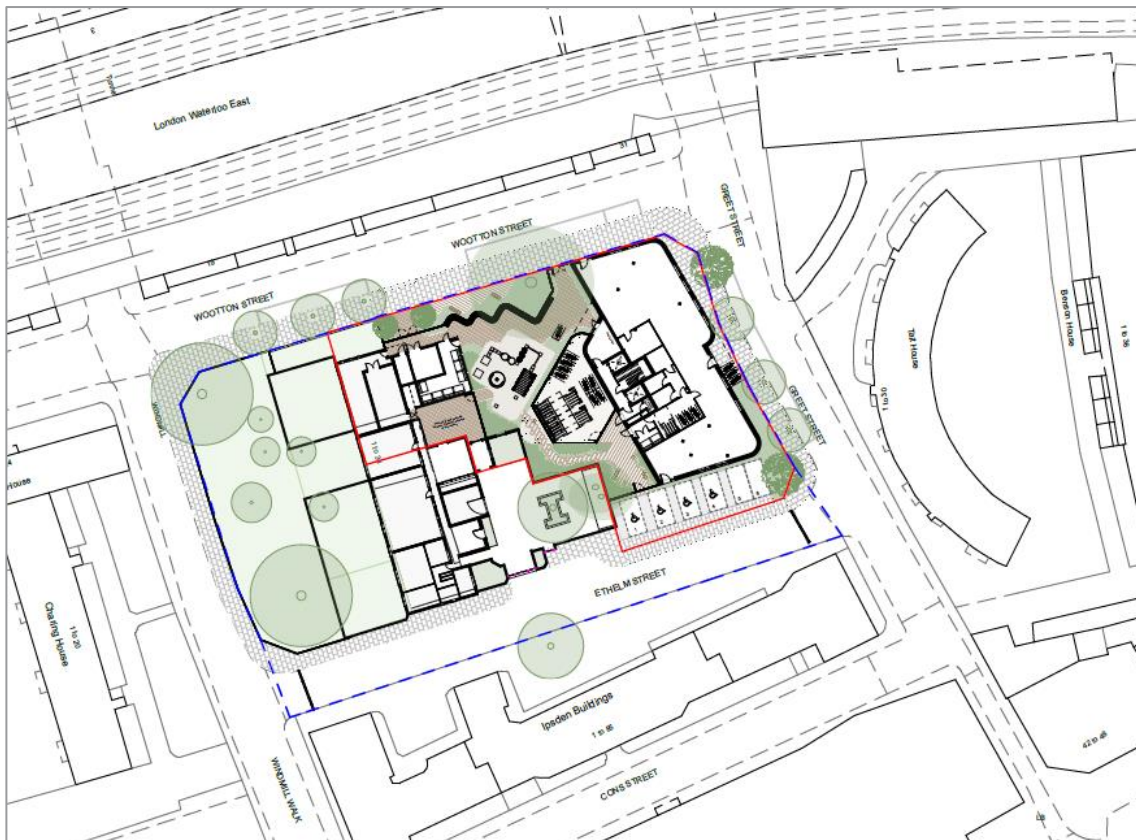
Proposed Site Layout – Stockwool Architects (December 2020)
